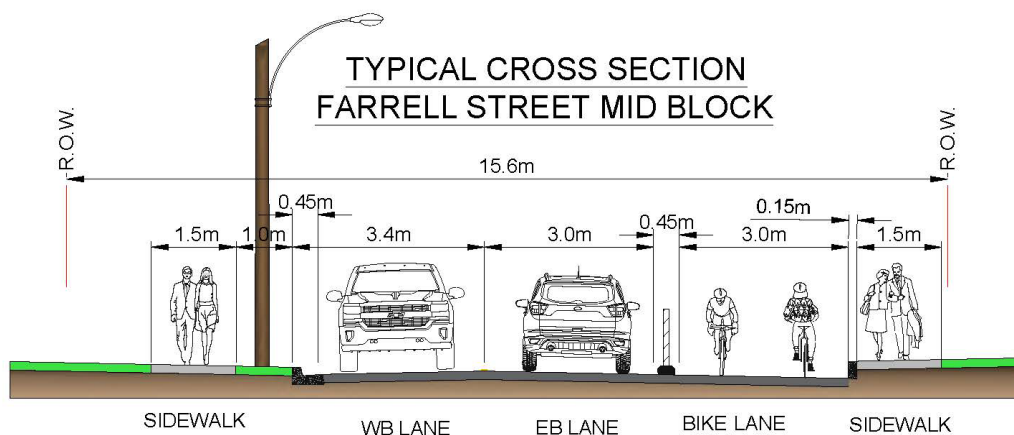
Cross section illustration of proposed Farrell Street bi-directional bike lane
